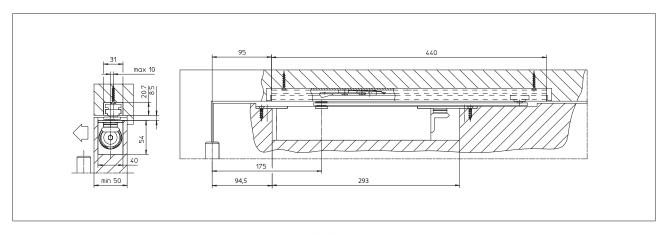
\cdot GEZE Boxer size 3-6 with guide rail Boxer with mechanical hold-open
